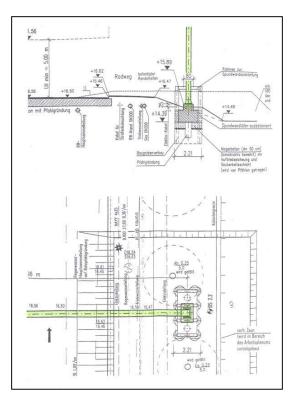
Original design concept with drilled shafts installed in to the highway embankment
